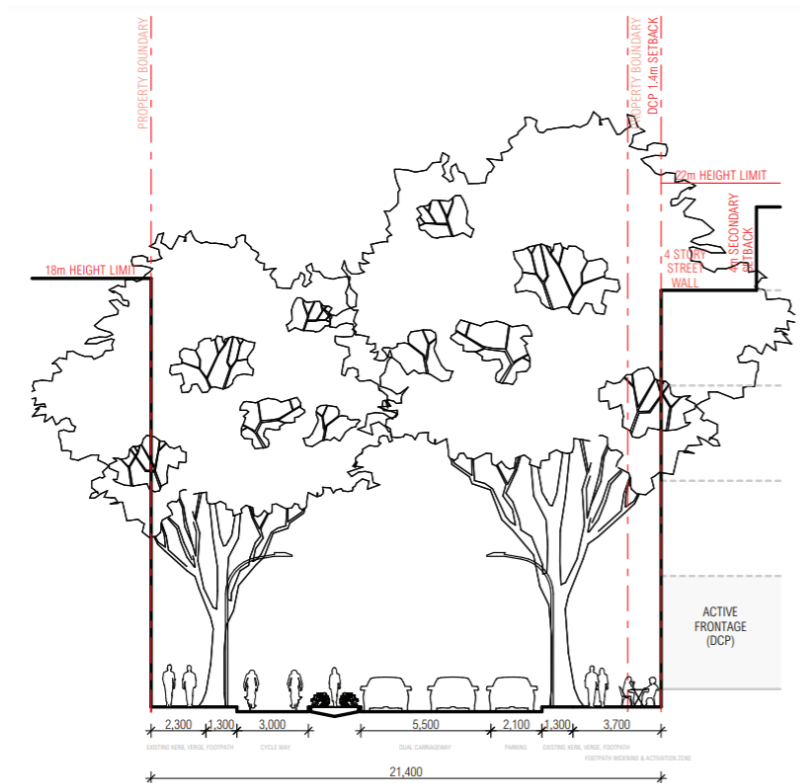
Indicative street section – Stokes Avenue, North Alexandria
